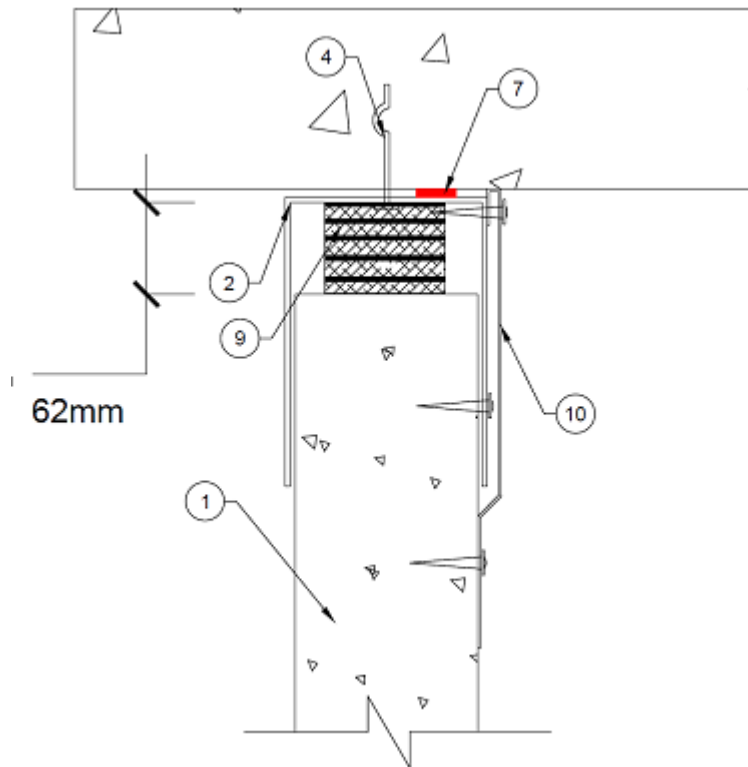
Head Detail 2 of the Wall with Initial Gap Size
